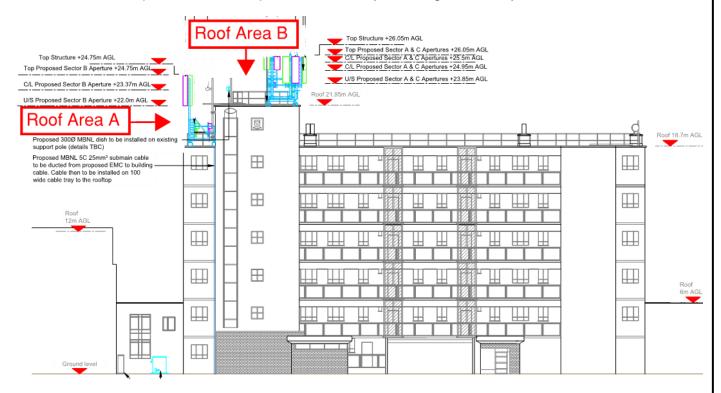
proposed NW Elevation A (extract from drawing number 265 issue I)
